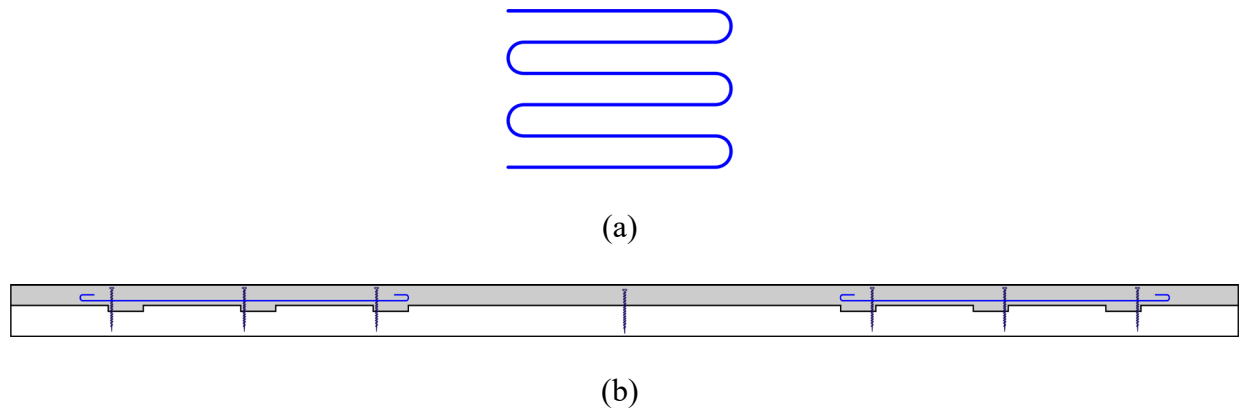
Simplification of the steel reinforcement in the composite floors (a) Continuous steel rod in the transverse direction (b) Continuous steel rod in the longitudinal direction
